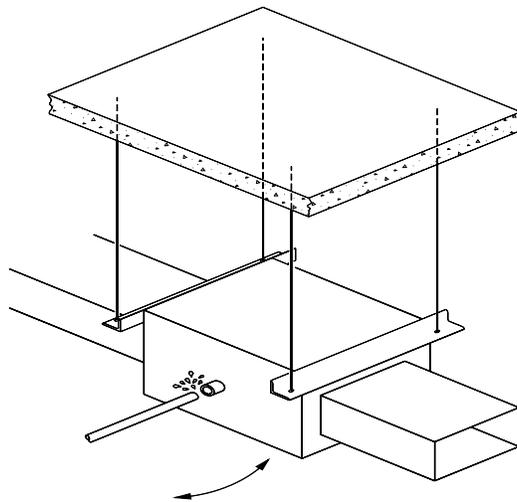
HVAC Heater Sways and Ruptures Brazed Copper Tube
